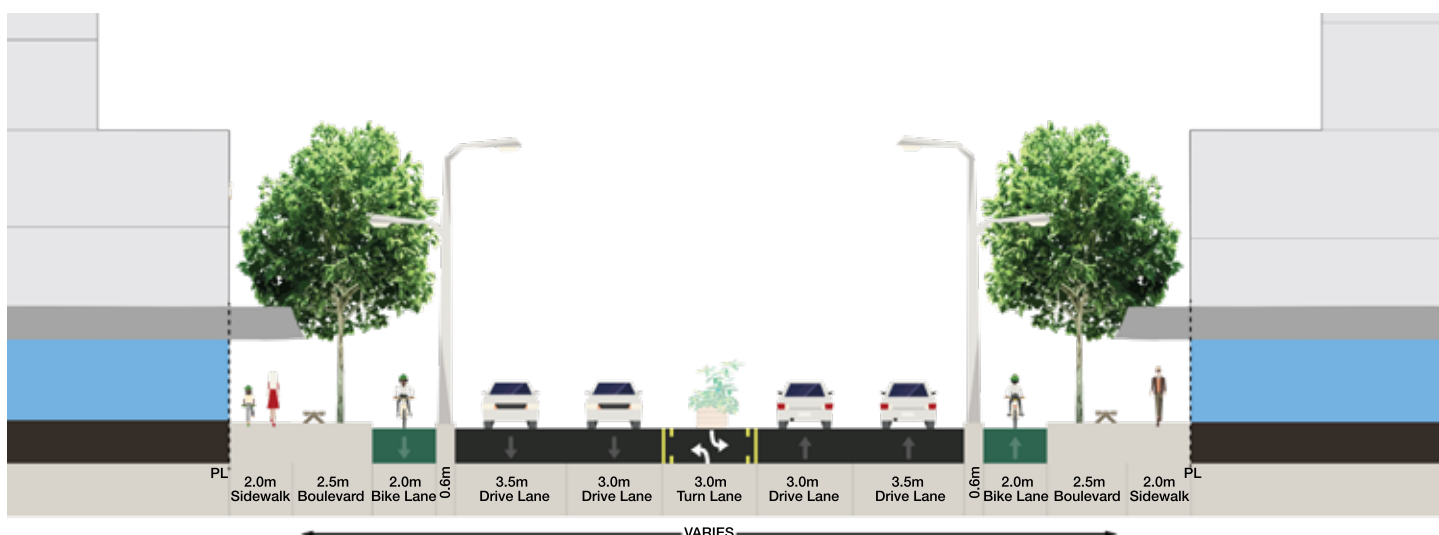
Conceptual cross section for Saanich Road (width varies)
